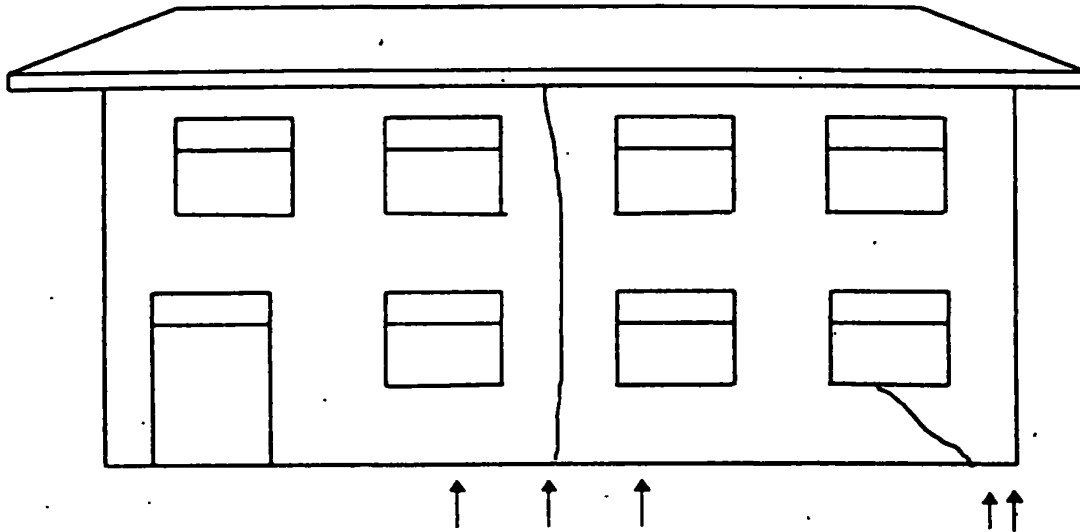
Swelling of clay under the centre and the edge of a building and the cracking due to it
